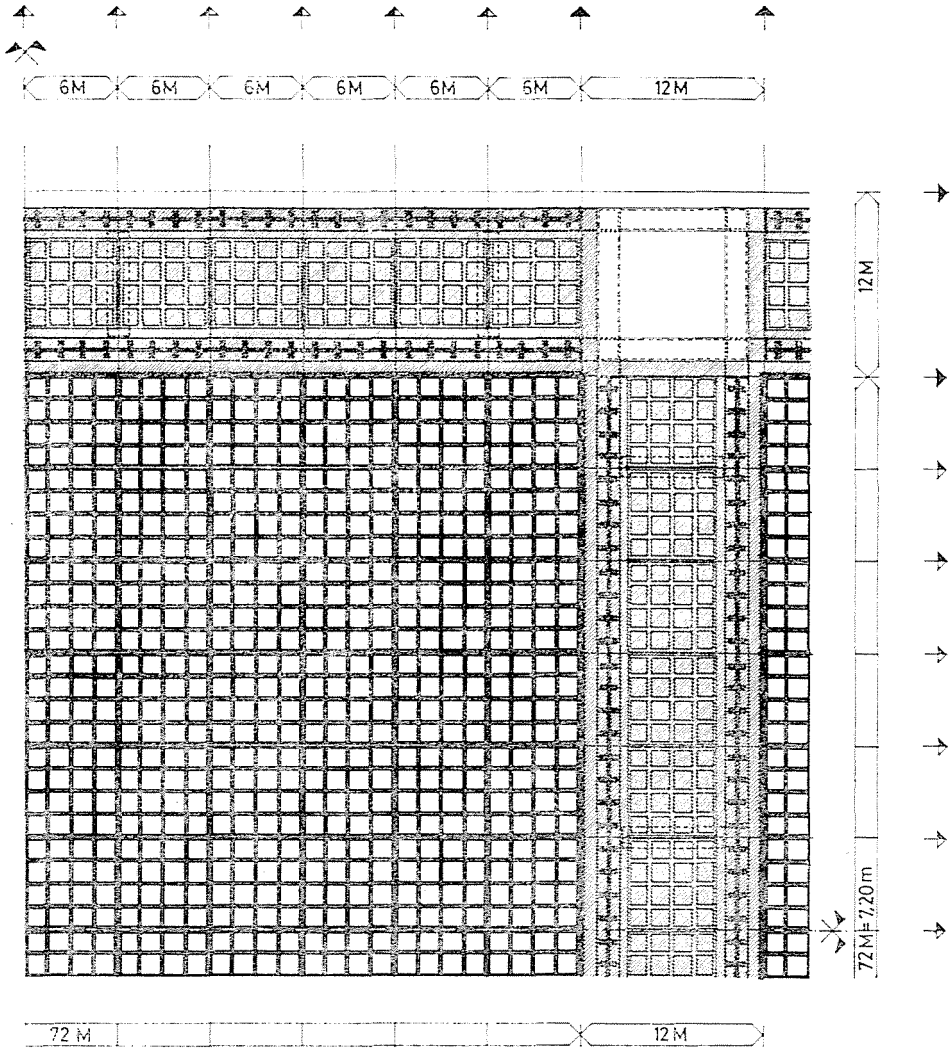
The lift-cell building method: The repetitive structural unit. The location of the pillar skeleton-frames, the beam box-frames, the cellular floor-fields and the floors above the beam-zones in the system of primary, secondary and tertiary grids on plan. The two-way ribs of the cellular floor-field (that is a frozen r.c. shell plane structural element of parameter size in two directions) always fit on the $6M \times 6M$ secondary grid. The cellular floor-field is rigidified with a membrane which, in turn, is fortified by the two-way ribs of the structural tissue. The r.c. ribs of the structural tissue always fit on the $1,5M \times 1,5M = 4mc \times 4mc$ tertiary grid. The same applies for the floors above the beam-zones. The formula of double co-ordination: $3M = 8mc$
